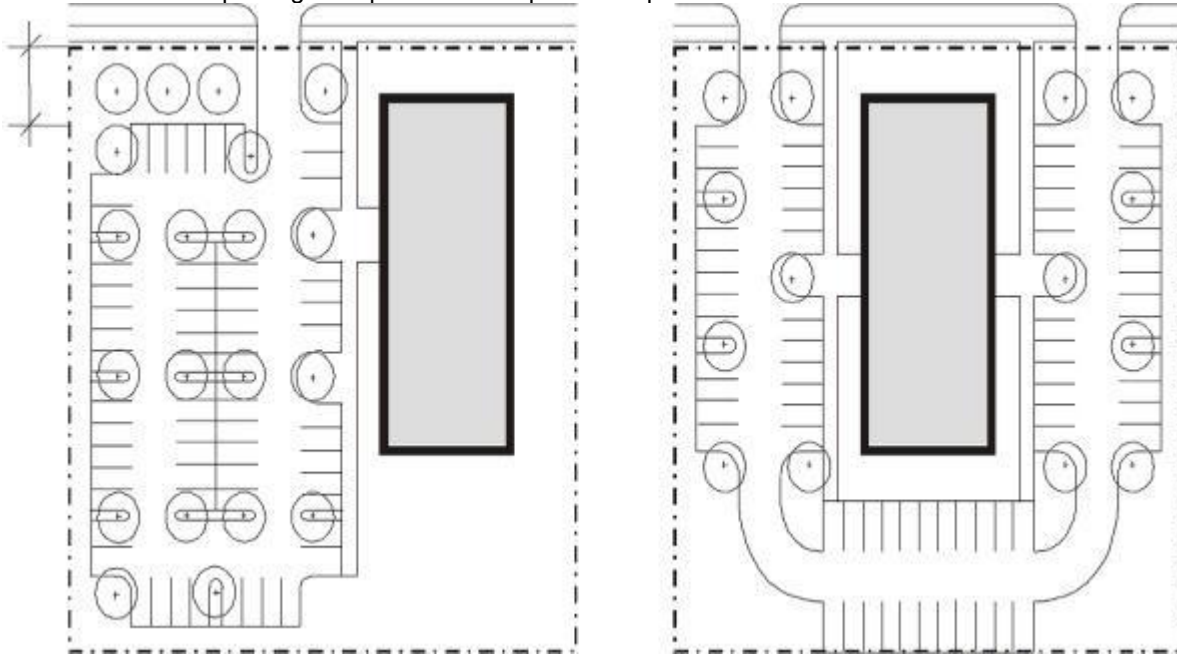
Figure Exception to 20.50.140(E): A consolidated parking scheme (left) with more than 30 spaces may be permitted if it is buffered from the street and produces improvements from a separated parking scheme (right), such as a better open space layout, fewer curb cuts, etc.
